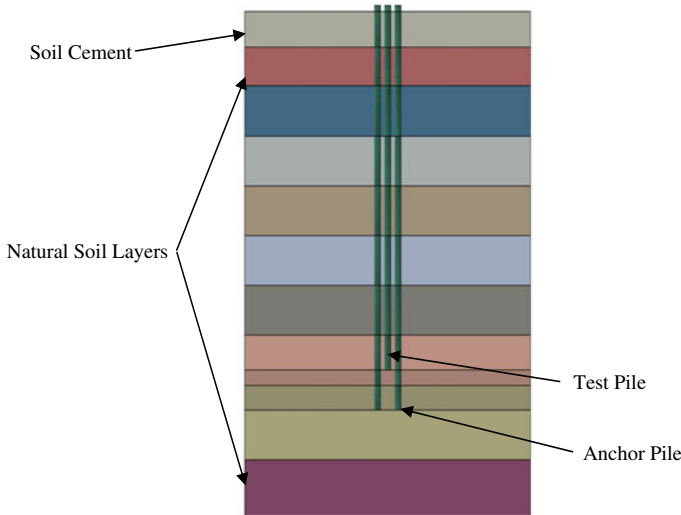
Cross-section view showing soil layering with test and anchor pile arrangement
